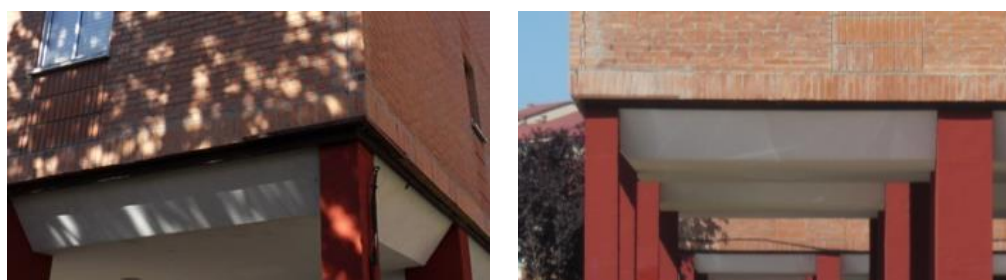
Reinforcement in the bottom of façade with steel profile
